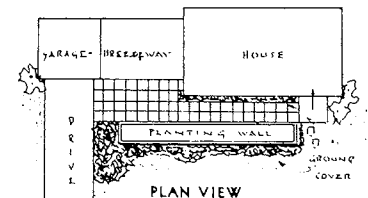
Overall (left) and plan view (above) of planting wall in a well-designed landscape.
